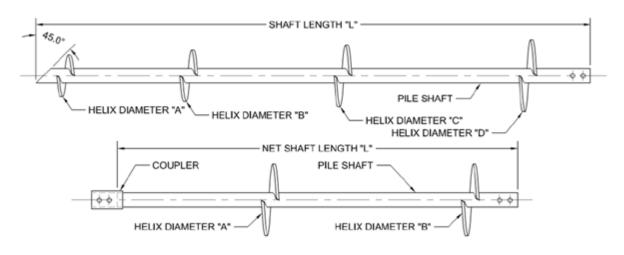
TYPICAL HP288 SHAFT LEAD AND EXTENSION SECTIONS AND HELIX PLATES
